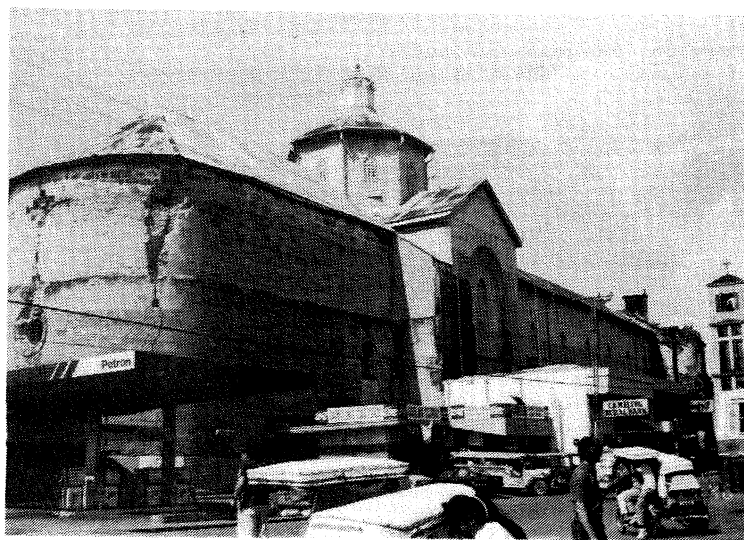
Camiling Cathedral; damage to nave as well as partial collapse of entrance tower (right hand end of church building)
